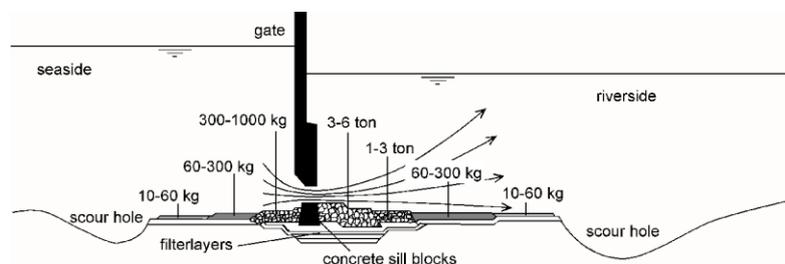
5. Cross section bed protection of Maeslant barrier (Schiereck, 2001)
